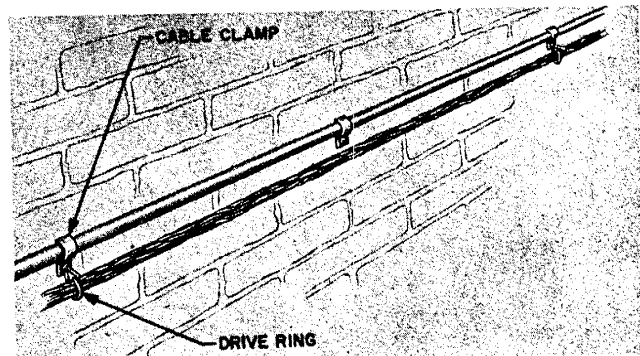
Drive Ring or Bridle Ring Run Paralleling Cable Attached with Cable Clamps
